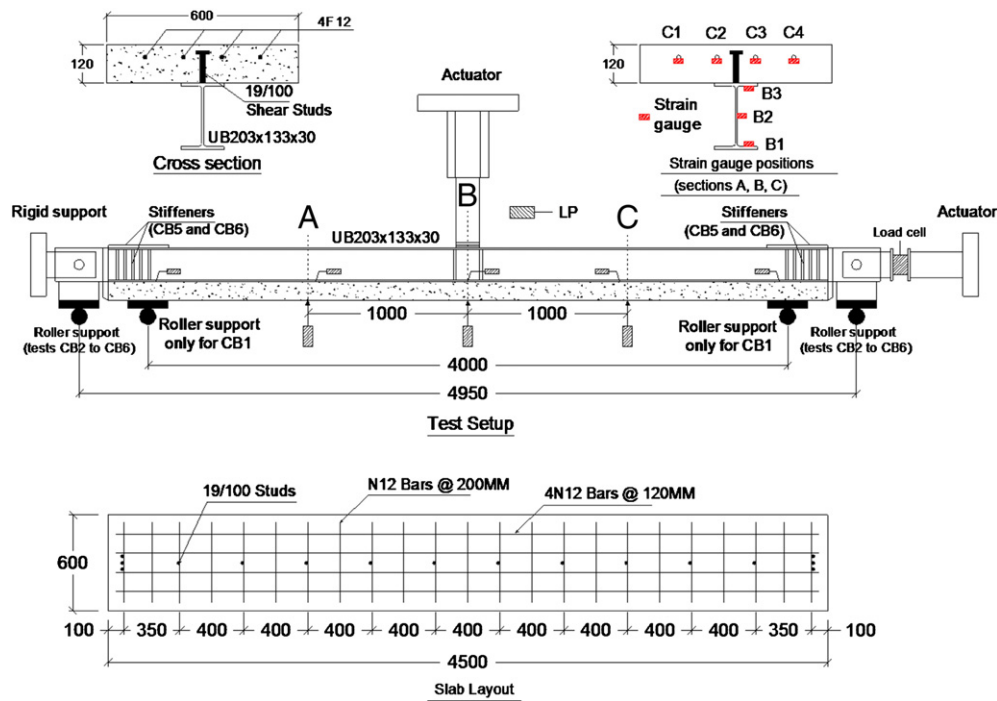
Geometric details, test setup and instrumentation of the testing procedure.
